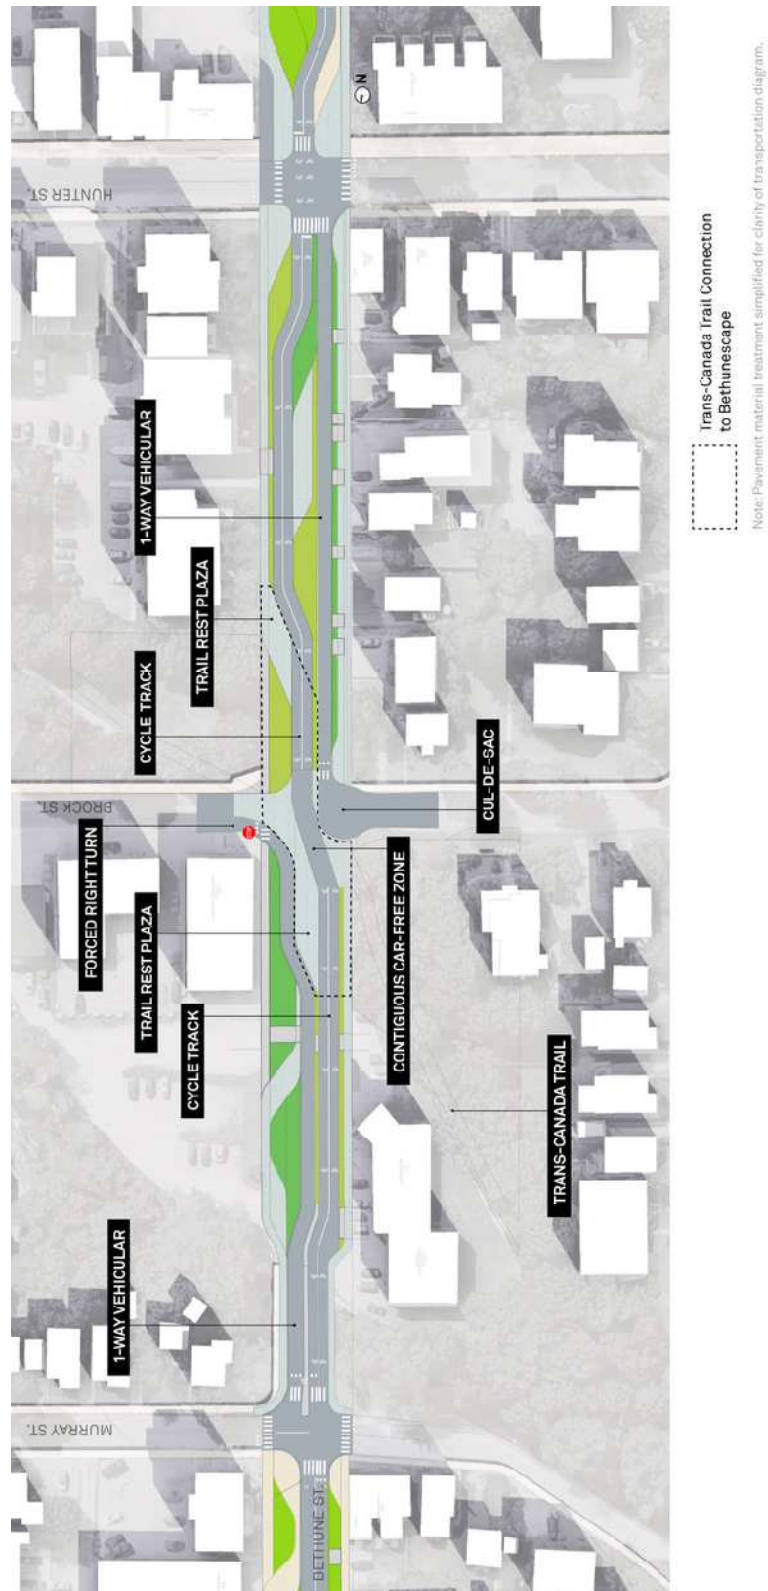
Original Bethunescape – Hunter Street to Murray Street Movement Flow
